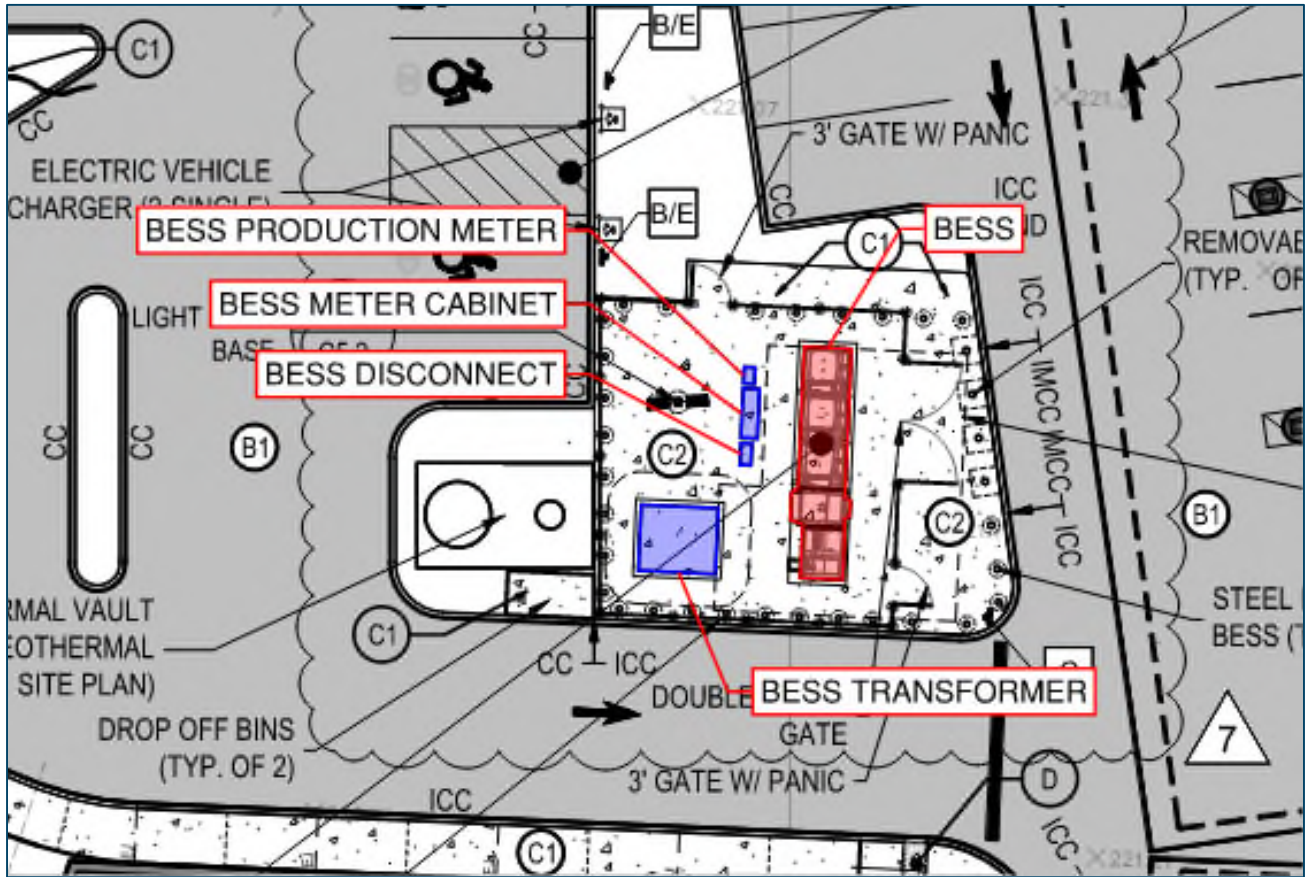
Proposed BESS Location and Adjacent Exposure Hazards (equipment pad plan).
